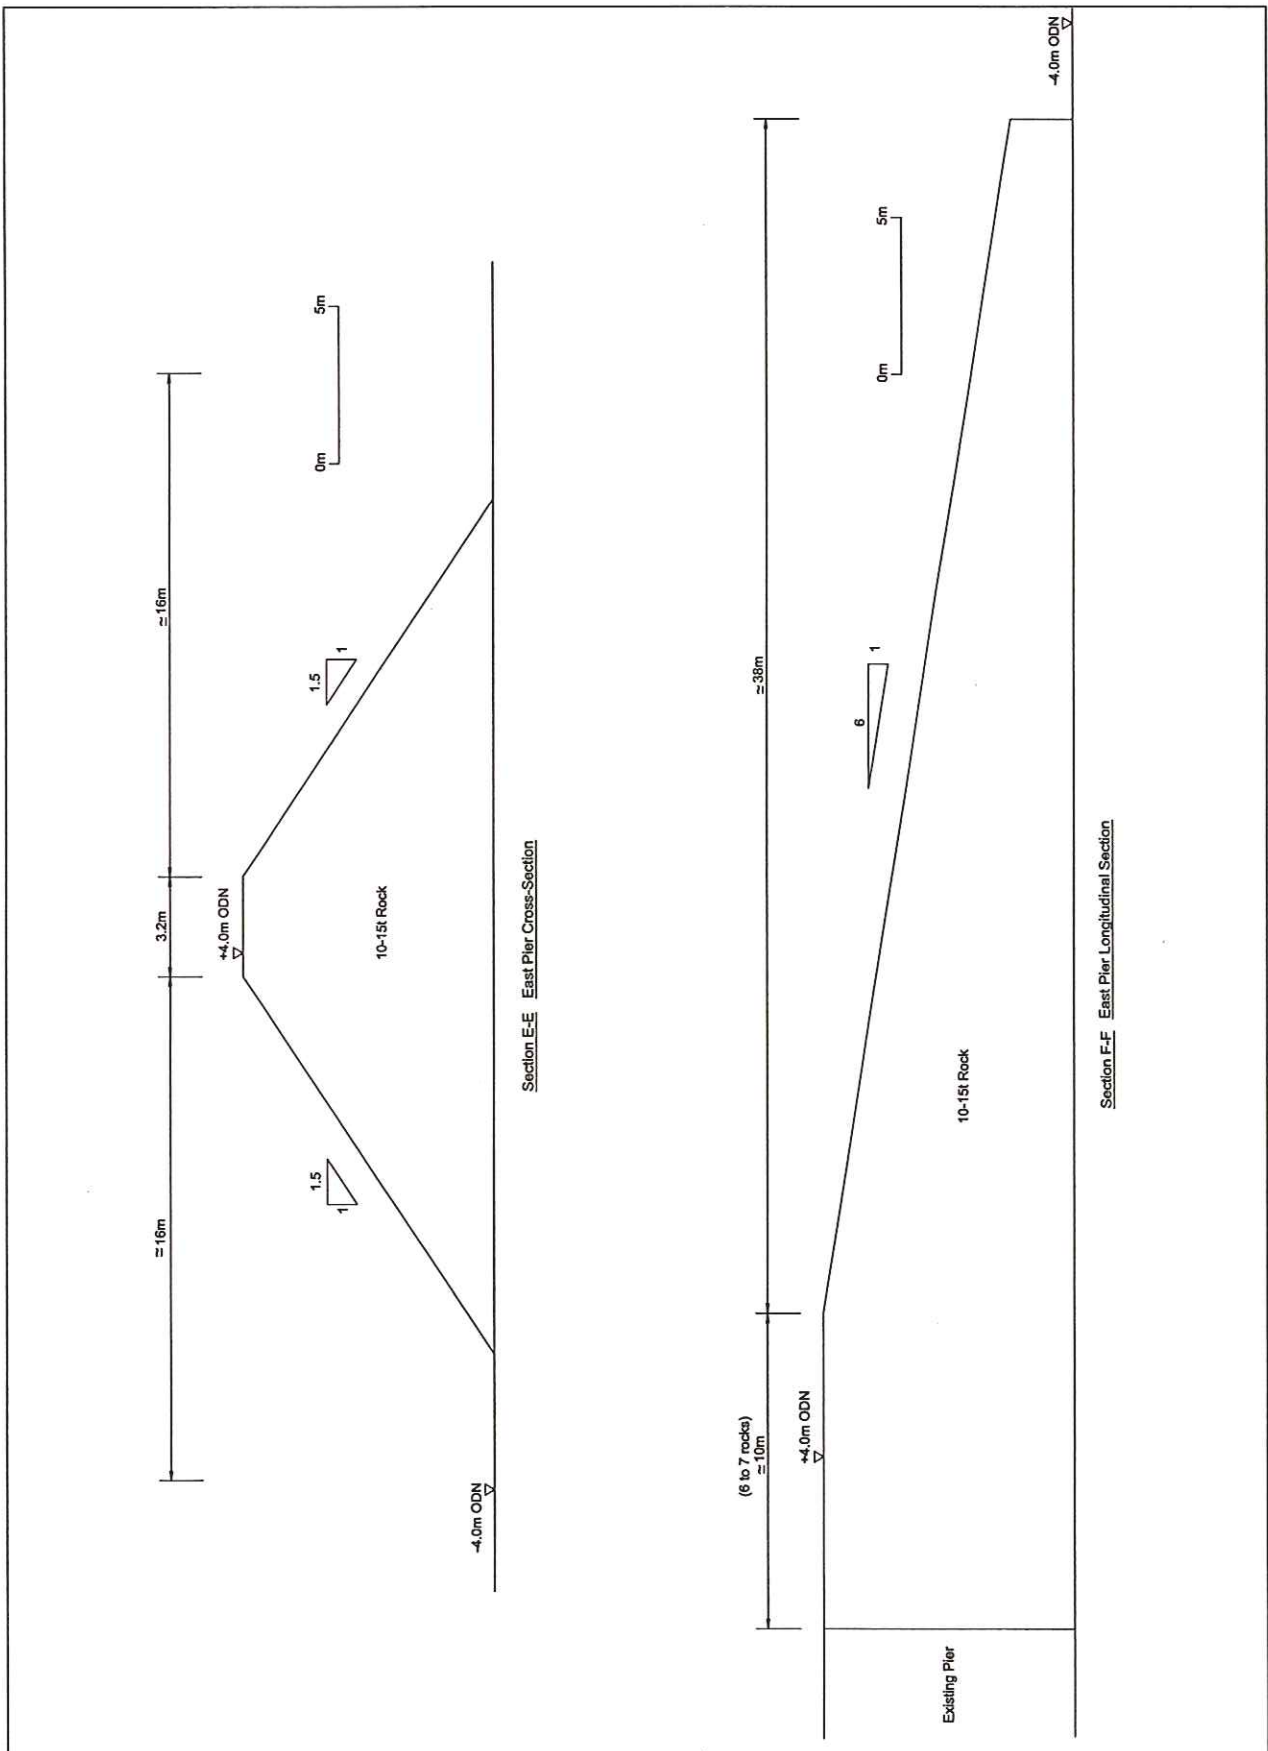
Typical sections through the proposed East Pier extension, Test Series 3, 4 and 5
